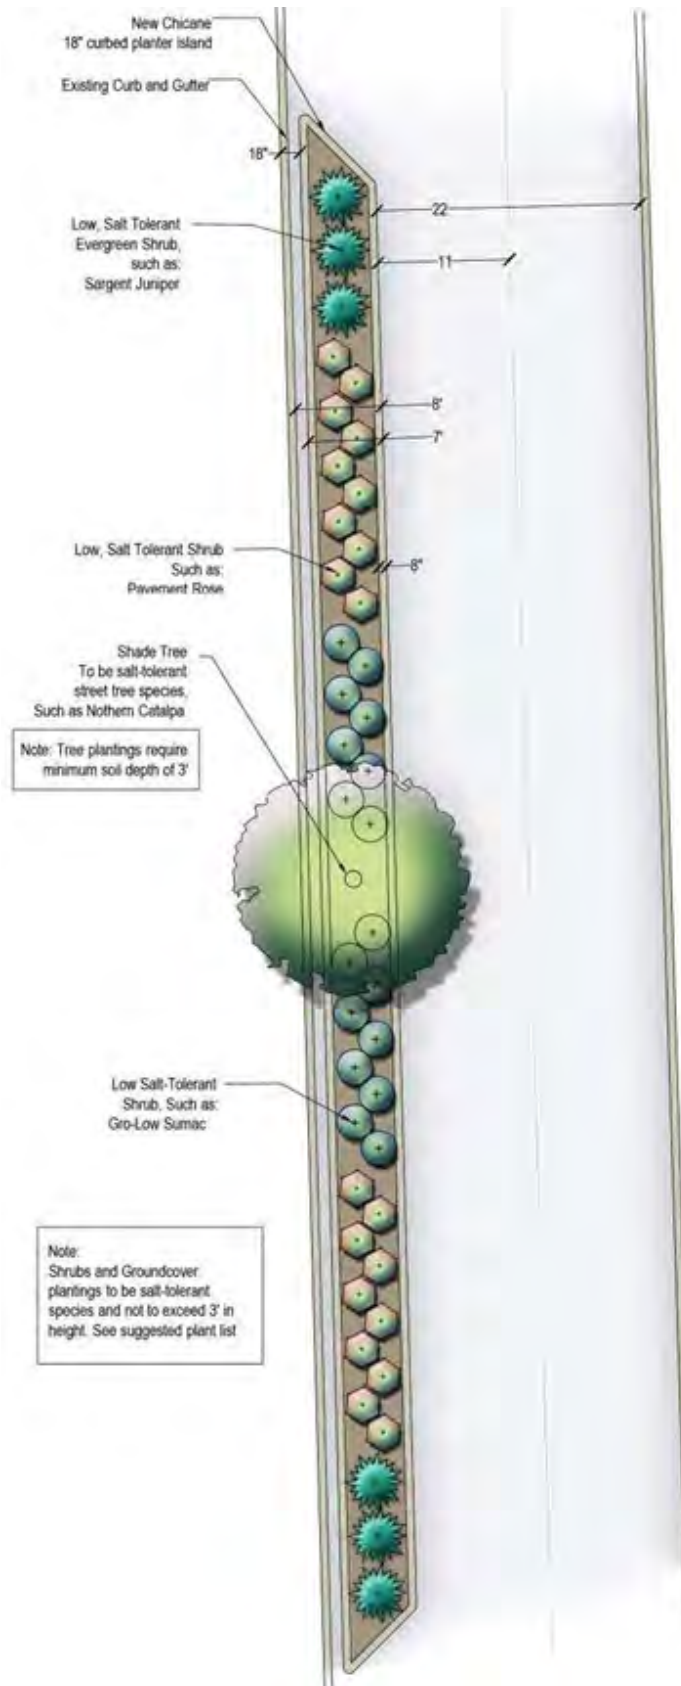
CONCEPTUAL CHICANE PLANTING PLAN IN LIBERTY GROVE
